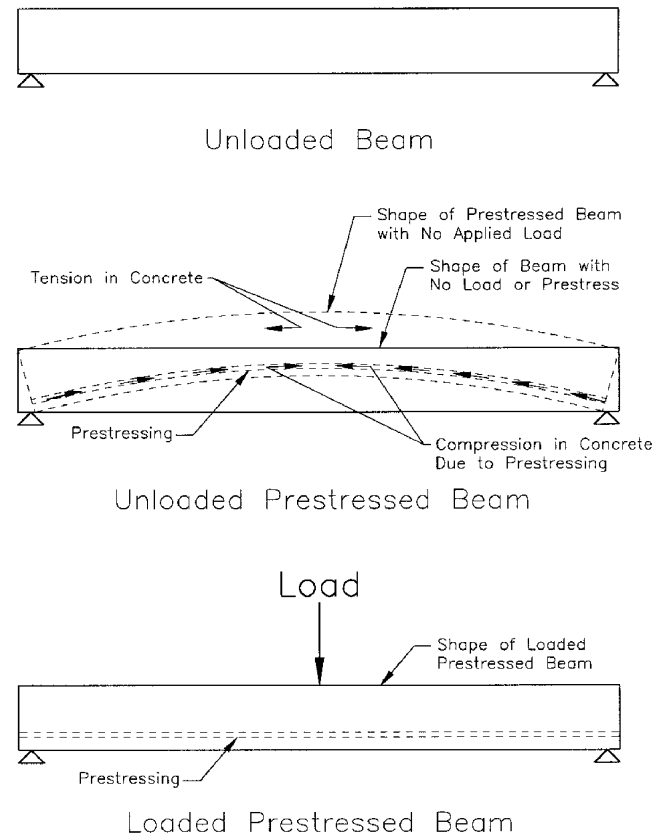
In a prestressed simple beam, the prestressing steel is placed near the bottom of the beam, just like regular reinforcing steel. But in the prestressed beam, the prestressing causes the unloaded beam to bend upward in the middle, opposite to the downward bending caused by the applied load. The combined effect is a beam that bends less, and therefore cracks less, under load.
